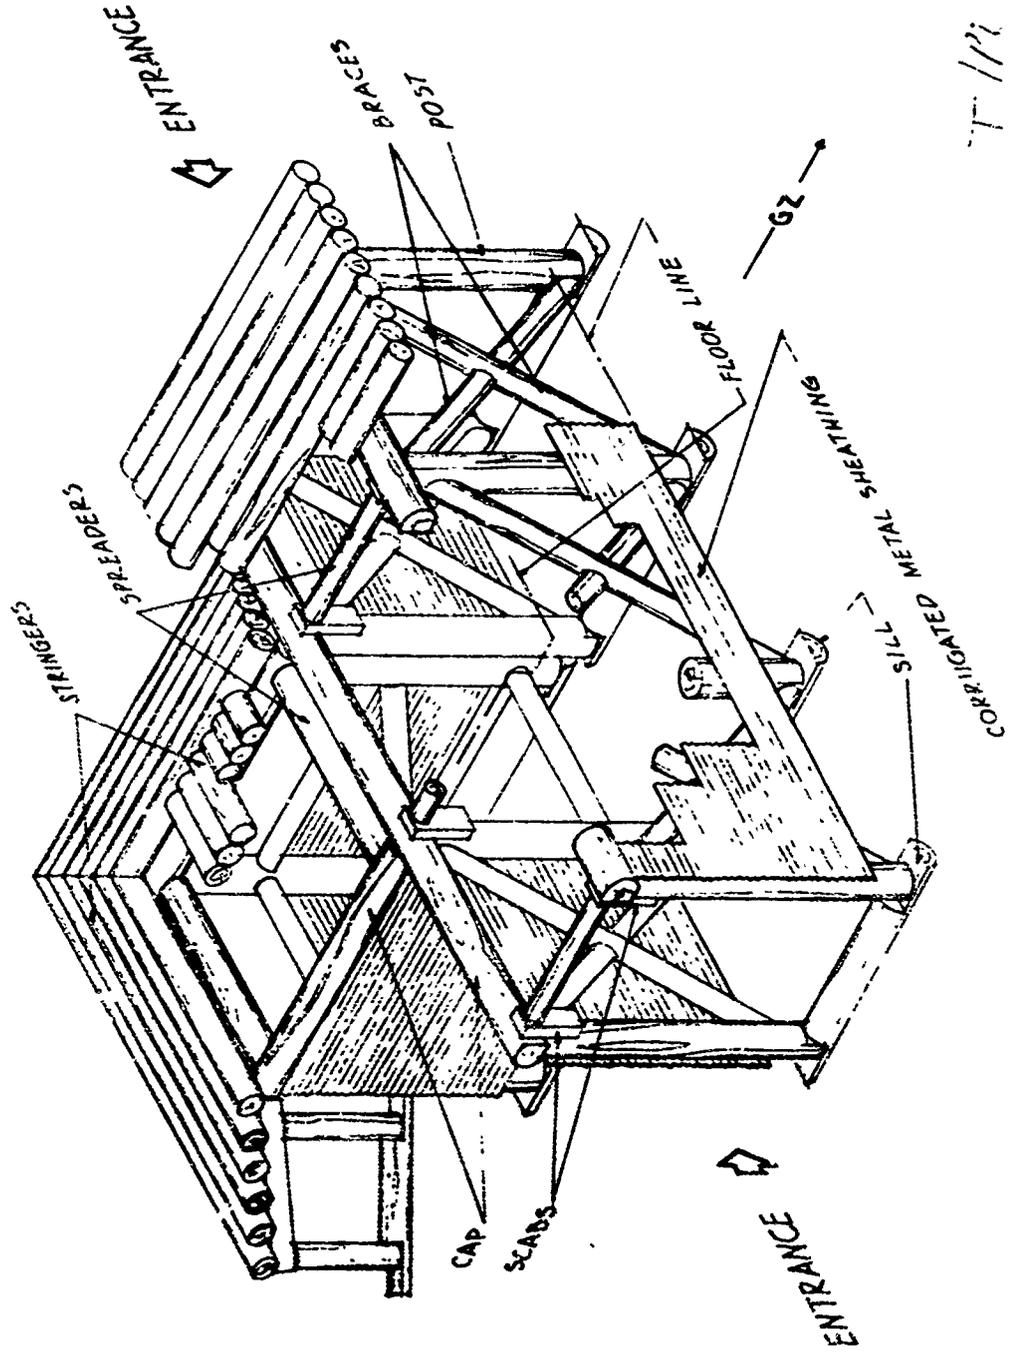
7' x 7' machine gun emplacement, notched dimension timber.
